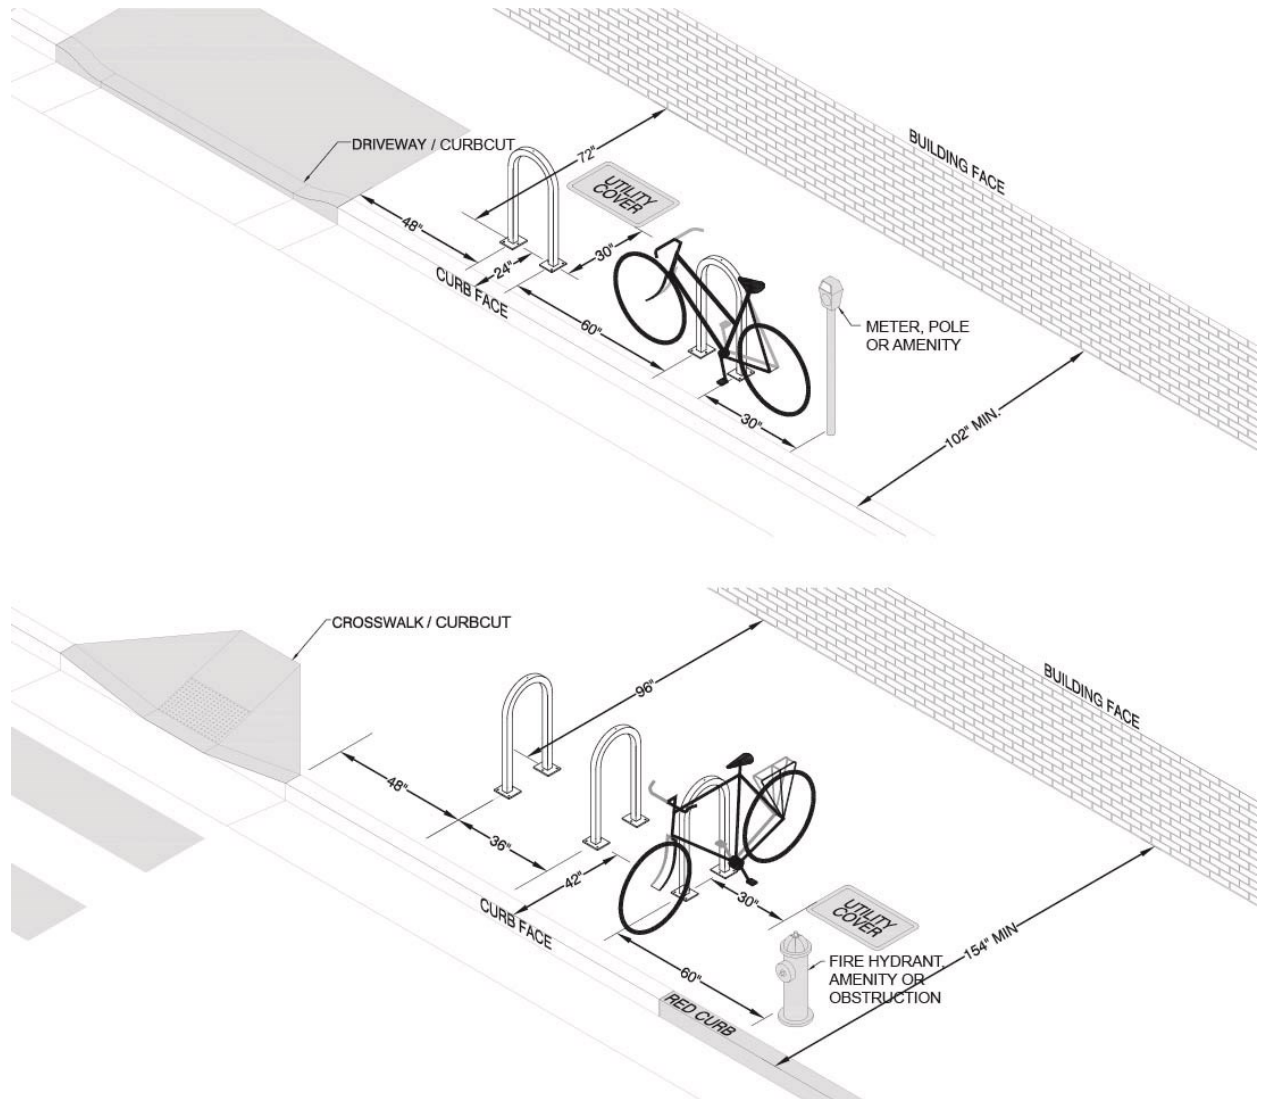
Bicycle Rack Parking Design Standards in Public Right-of-Way
